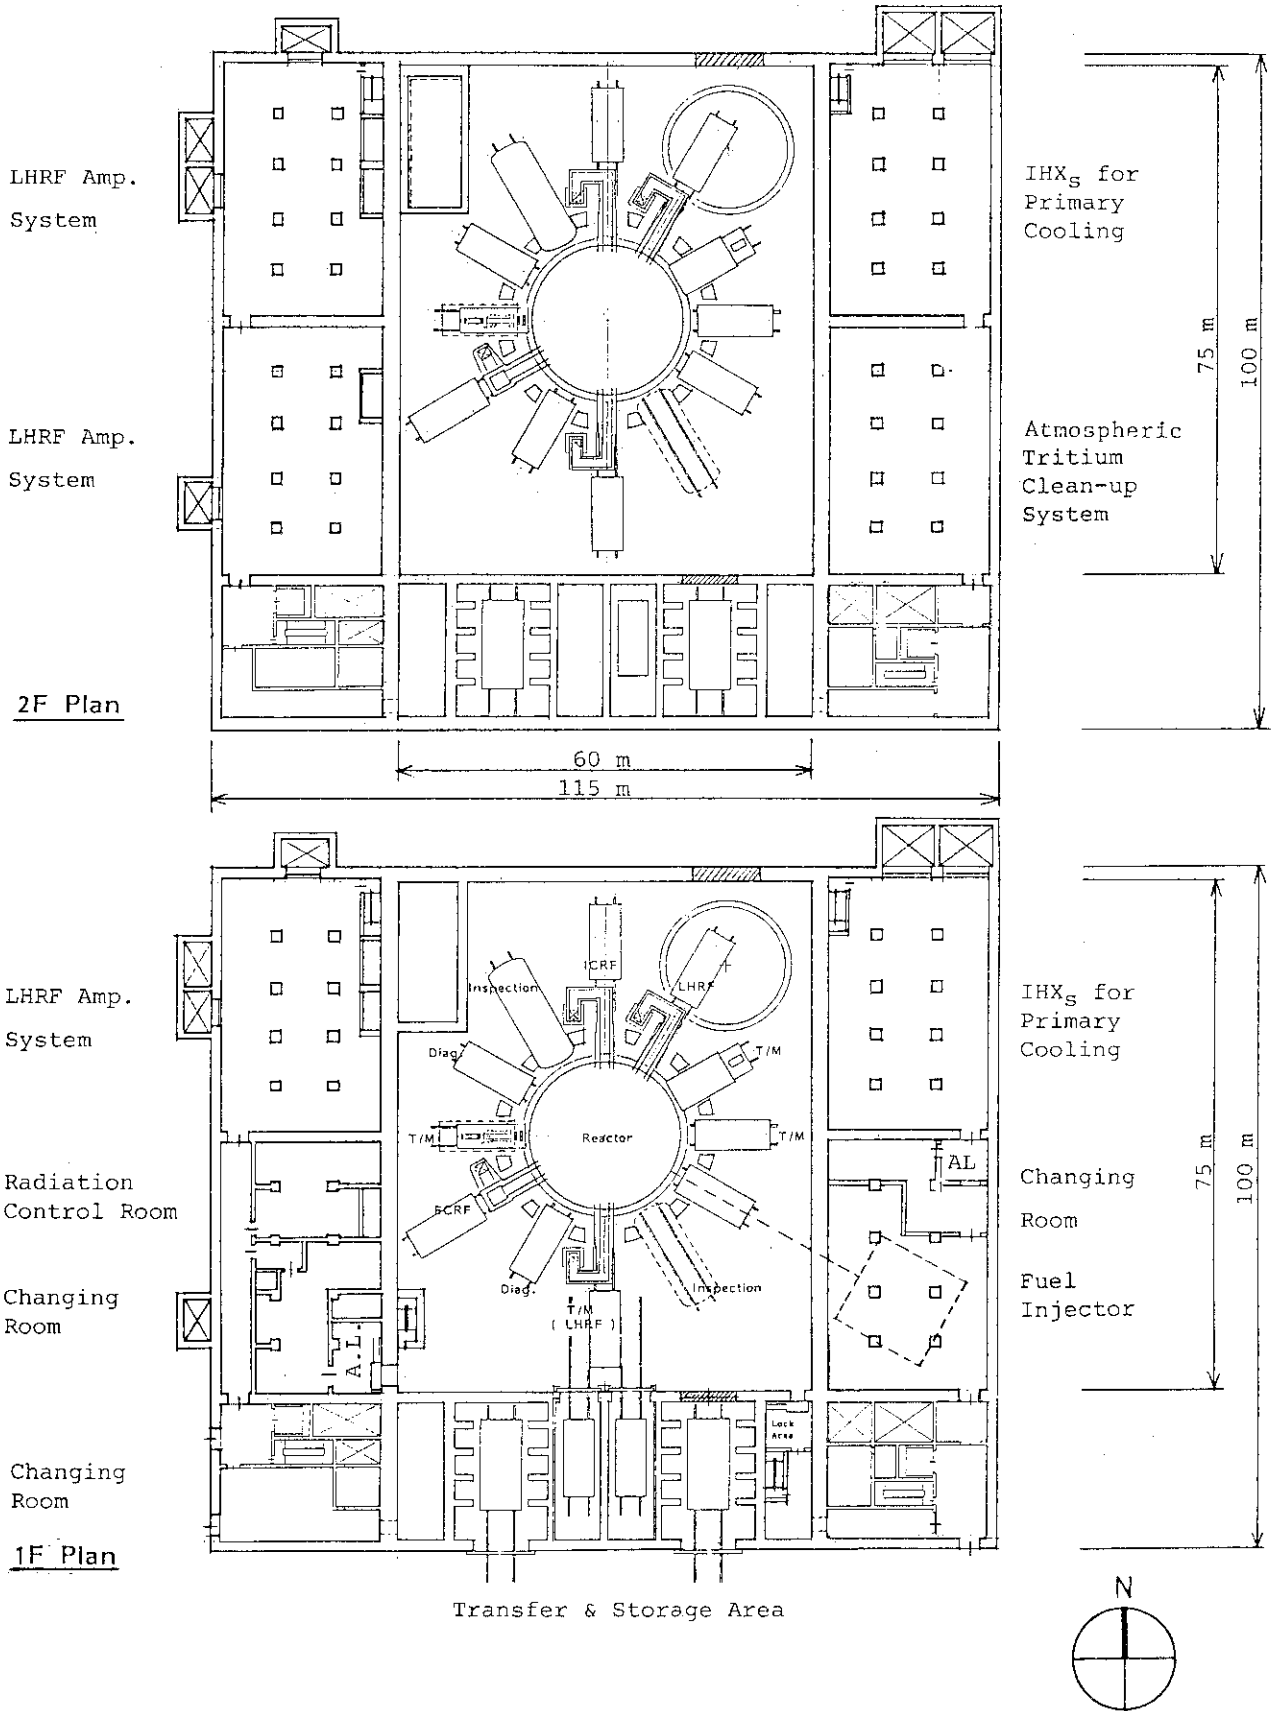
Layout of the reactor building (2/3)
